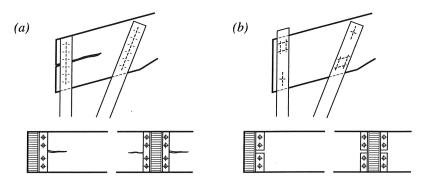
Joint details: (a) splitting due to shrinkage, (b) correct joint with oval shaped holes.
